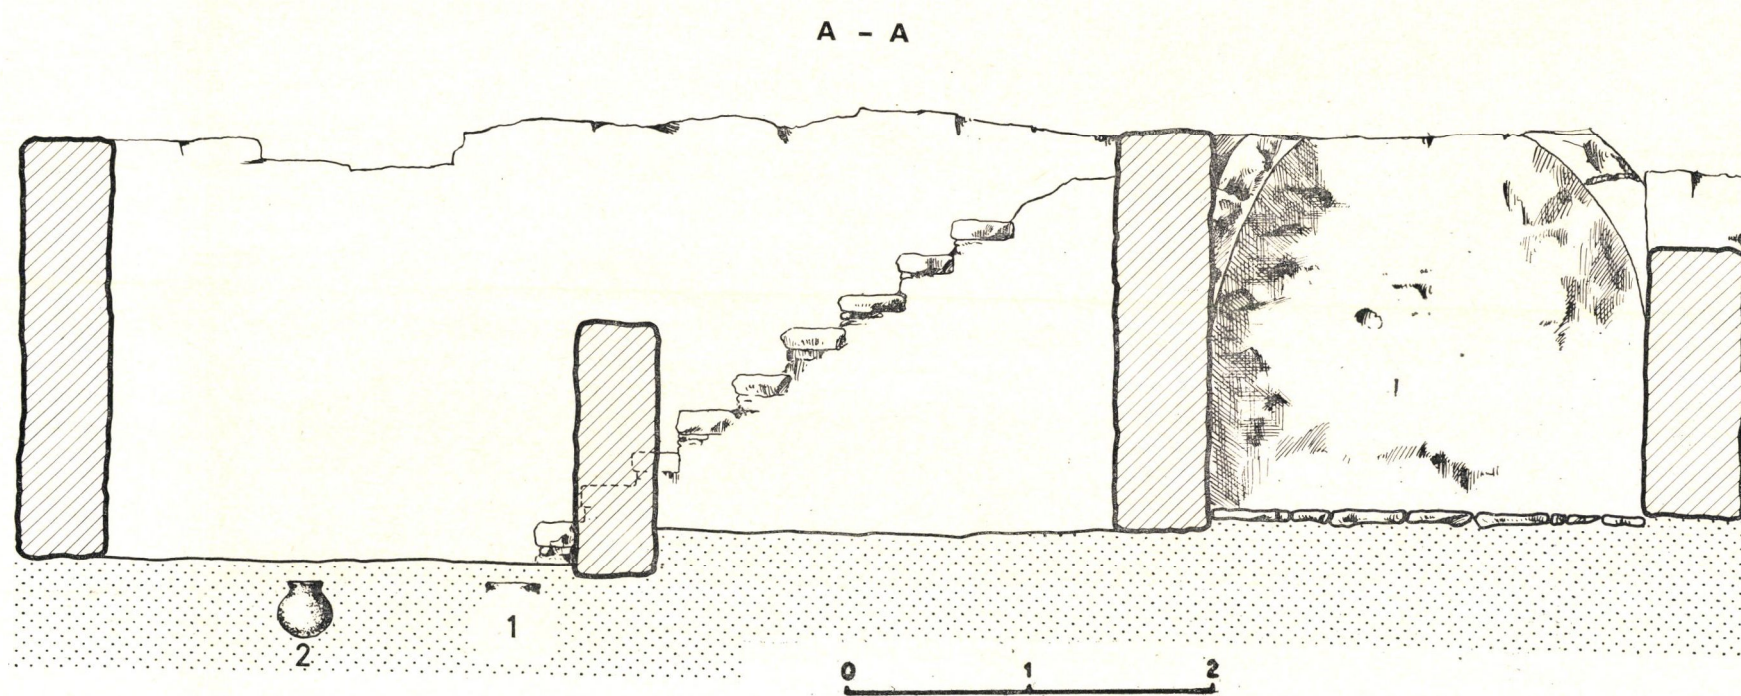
C/III, the section of rooms Nos 1 and 3 of the stone tower
